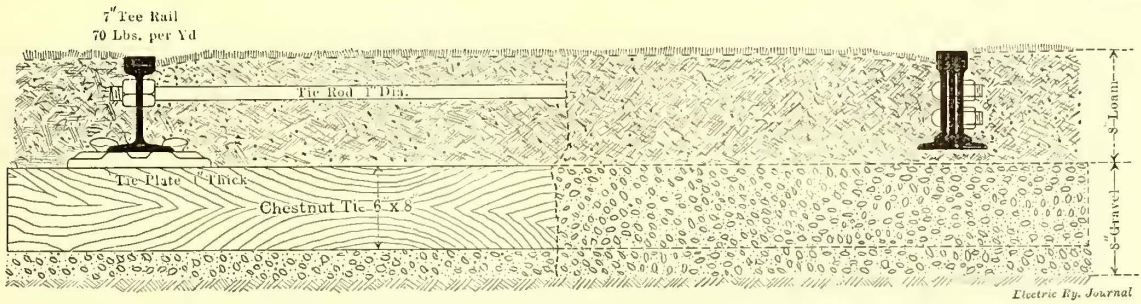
Boston Elevated Railway—High T-Rail Construction in Parked Streets
